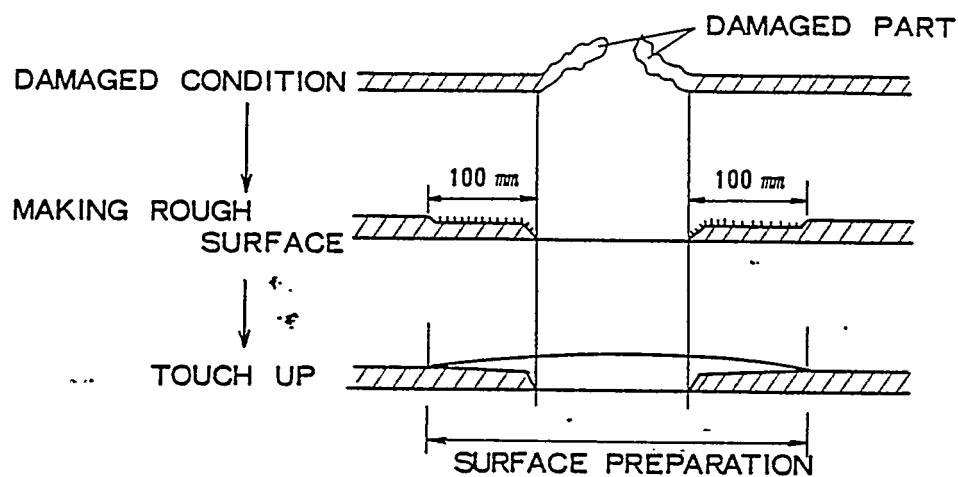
Surface Preparation/Touch-Up of Damaged Parts
